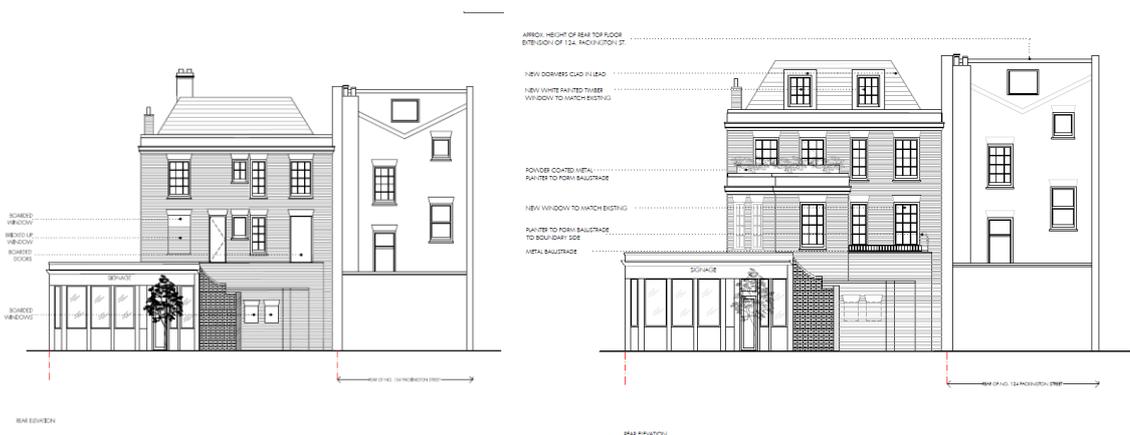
Existing and Proposed Rear Elevation of proposed extension and roof terraces
